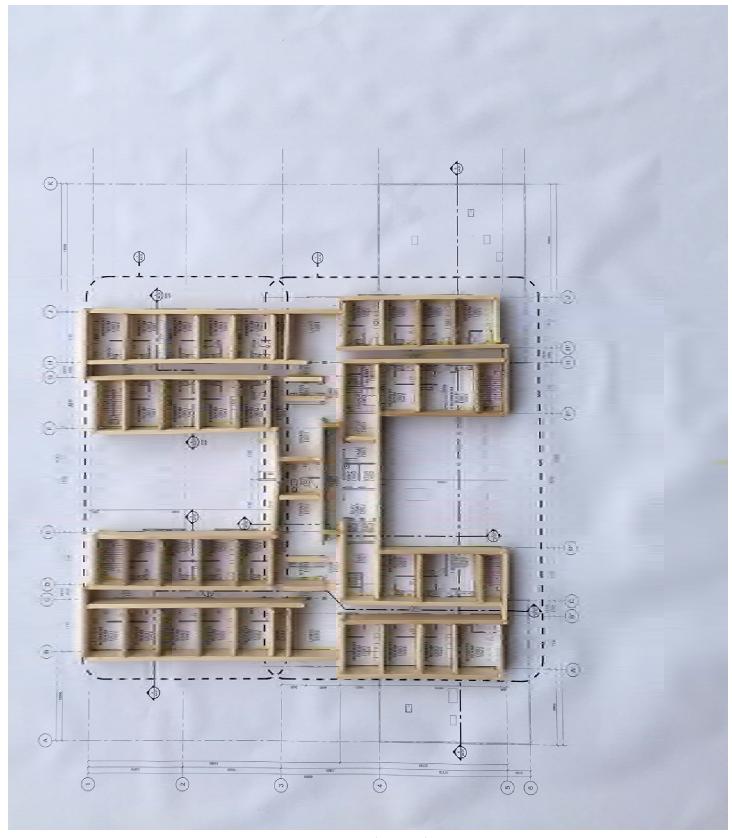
Layout Model of 2nd and 3rd Floors of Red Deer Building
